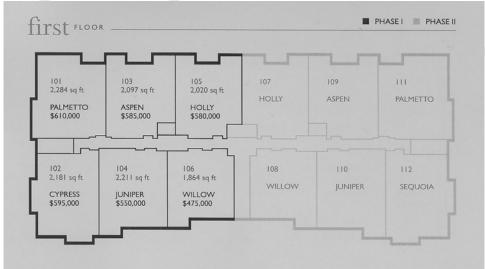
First Floor Phase 1 and 2 – Wellington Commercial Construction
